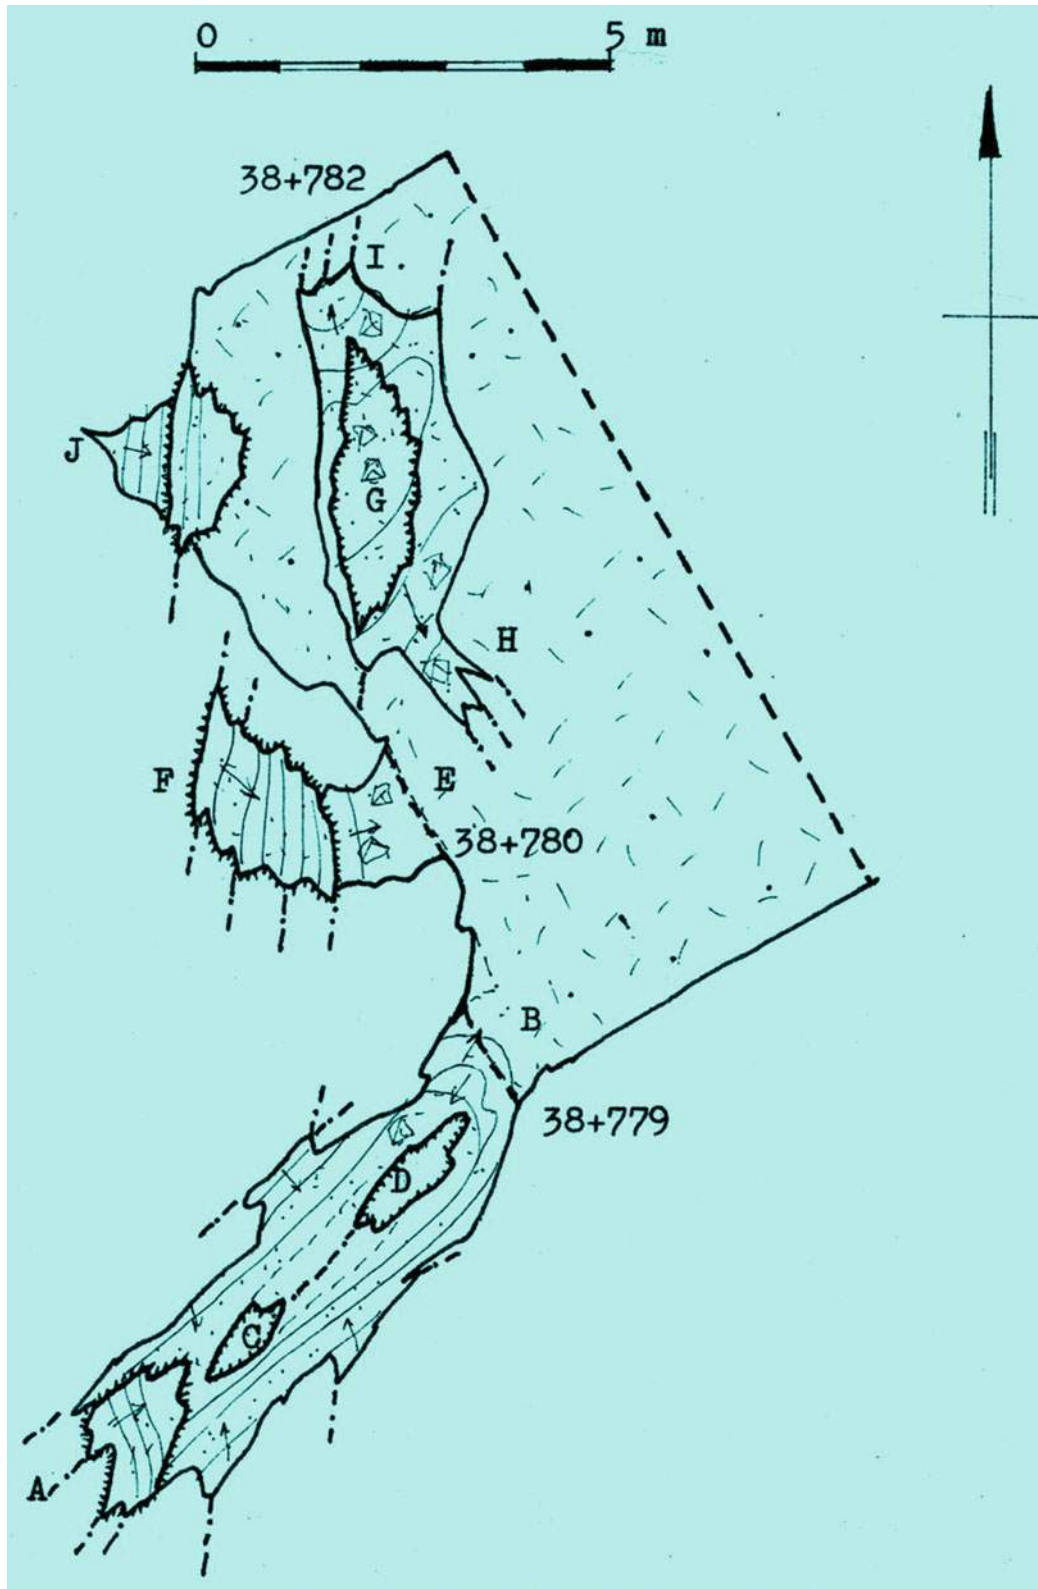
Plan of caverns at km 38 + 779 and 38 + 780 in Sopač Tunnel
